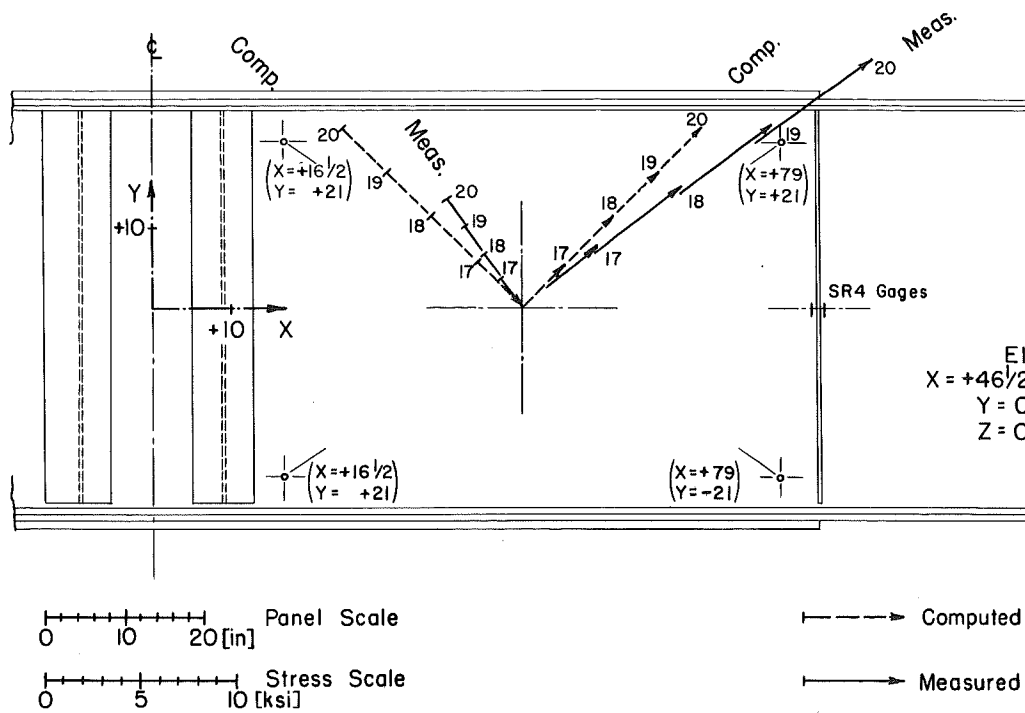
Principal Stresses at Panel Center, Girder E1
